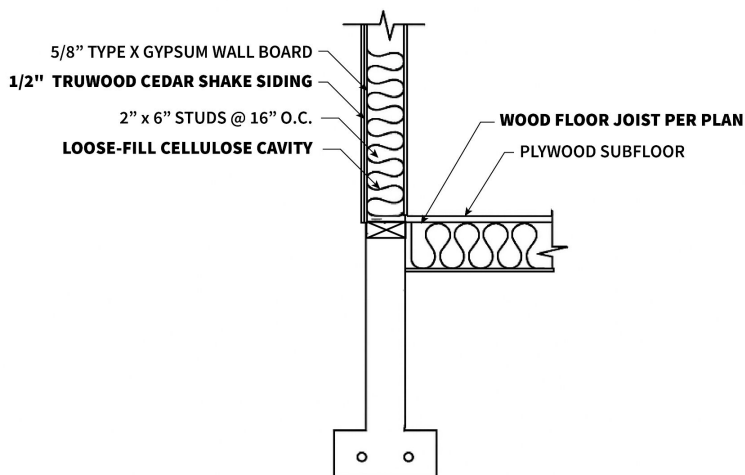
Architectural Details. Sample detail depicting low carbon details in bold including: loose-fill cellulose insulation, engineered wood siding, and timber floor joist over crawl space system, showing a few strategies from Pathway 3.
